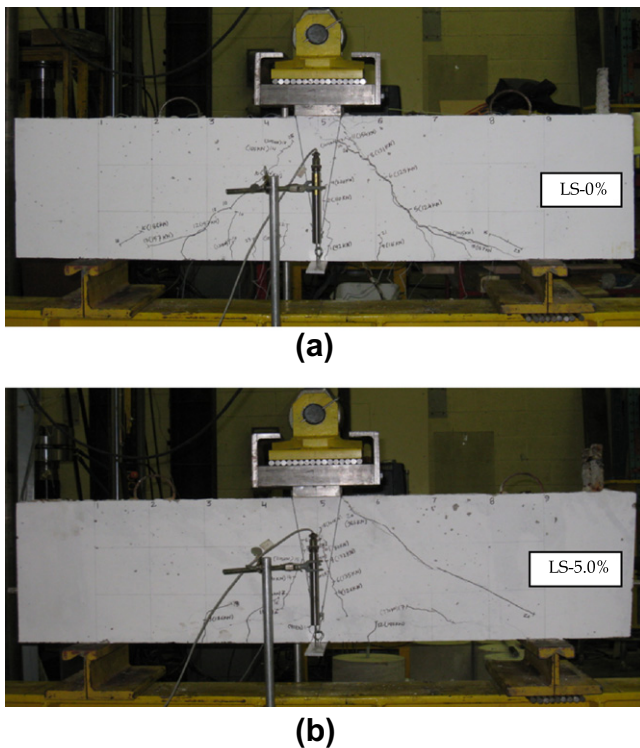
Series B (a) failure mode of control beam and (b) typical failure mode of corroded beam.
